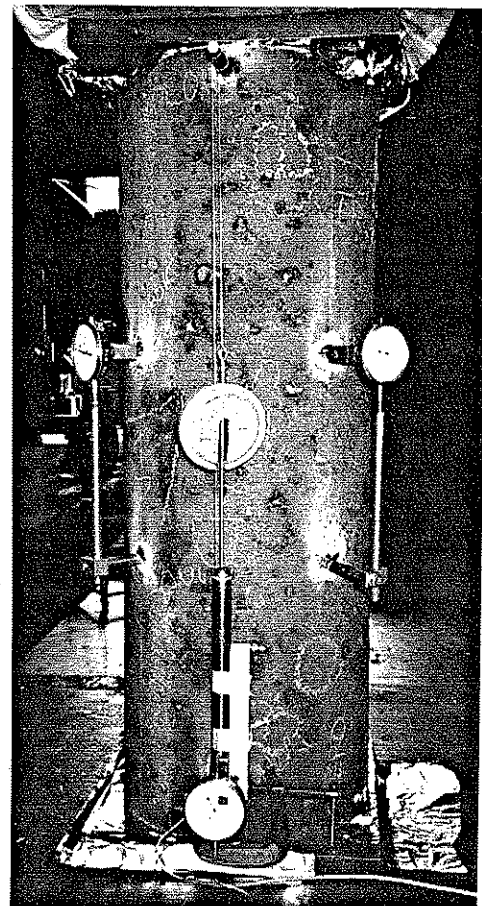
Instrumentation and Setup of Stub-Column C4-SC.
